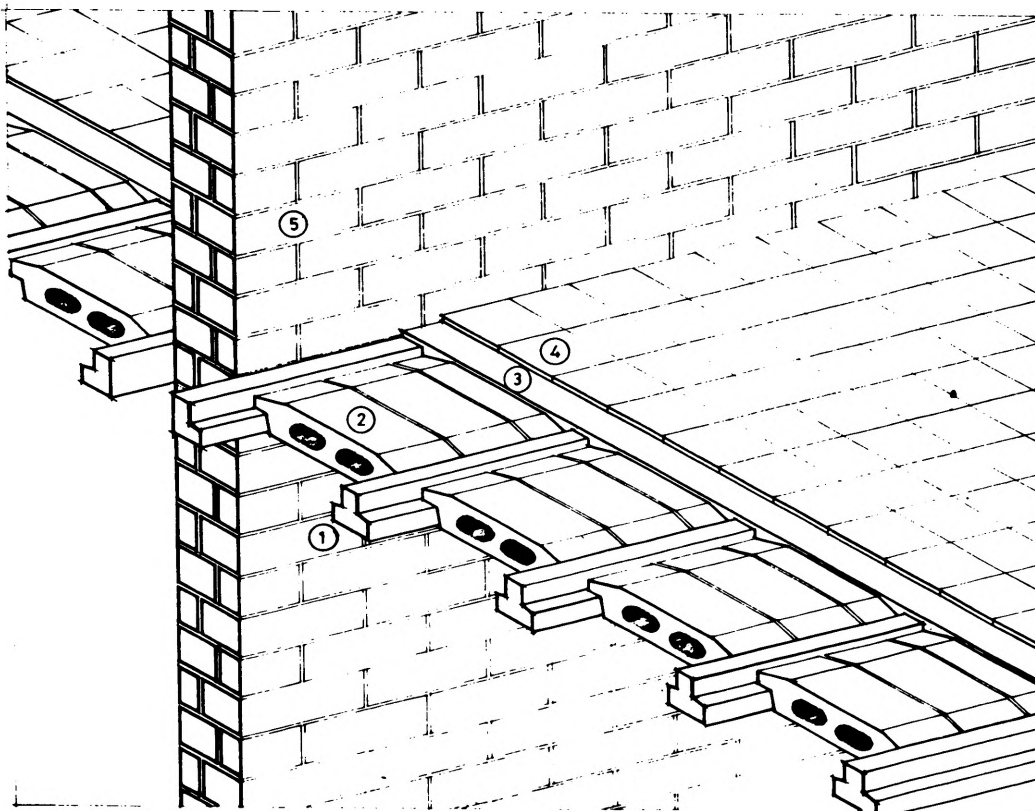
Isometric section showing the roof system. Filler block to span between concrete joists which coincide with 900mm grid.
